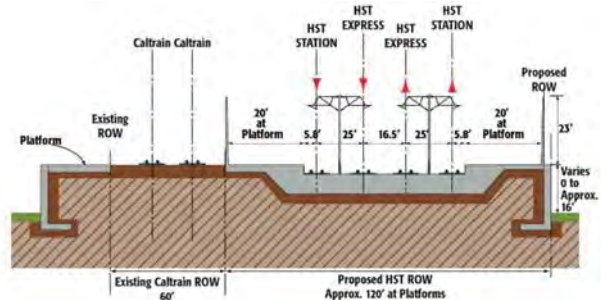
Causeway Section - Downtown Gilroy Station Area Plan, OPPORTUNITIES AND CONSTRAINTS REPORT, PUBLIC REVIEW DRAFT 11-15-15 - Plans
